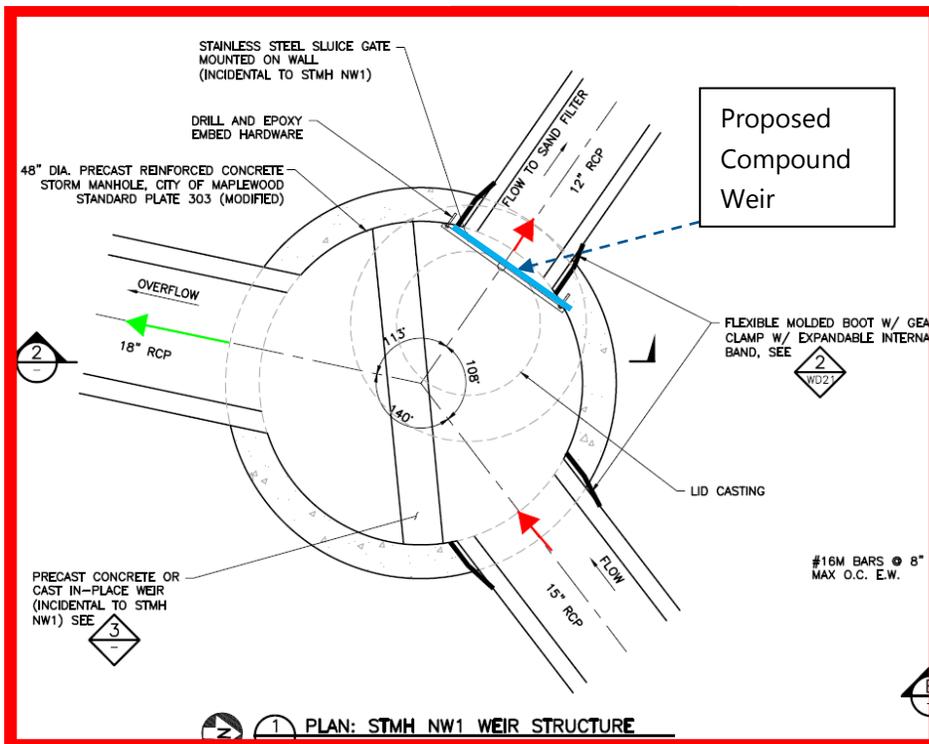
The Existing and Proposed Configuration of the NE Inlet Manhole (called NW1 on the plan drawings) of the Highway 36/61 Site
